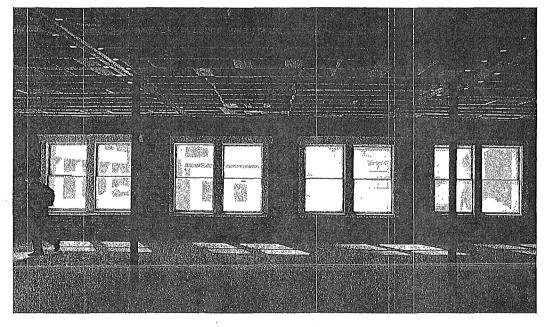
Photograph of typical east interior elevation (photograph taken on 02/27/2018).
